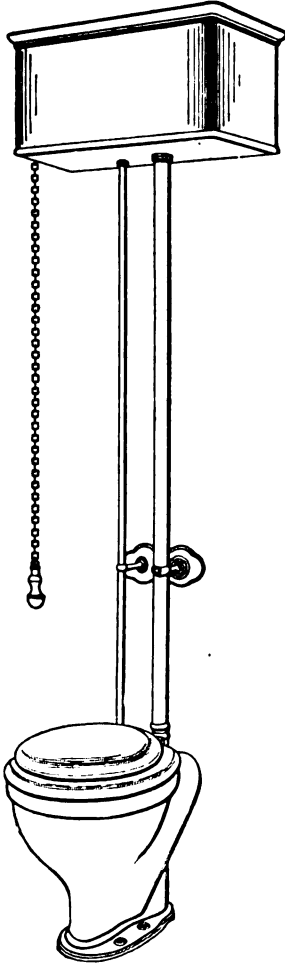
High-Tank Arrangement of Closet Fixtures.
